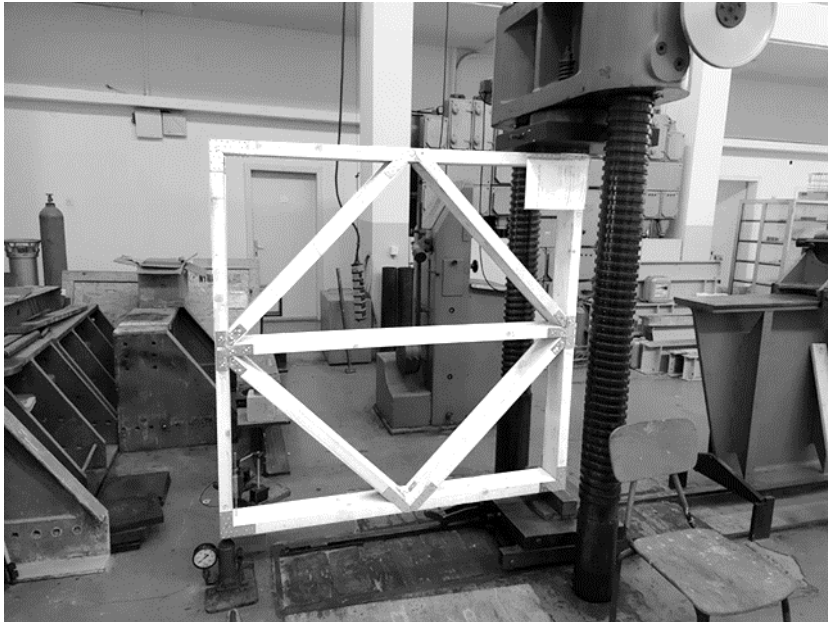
Testing Vertical Load on Floor Structure Element (Bašalić, 2024)
